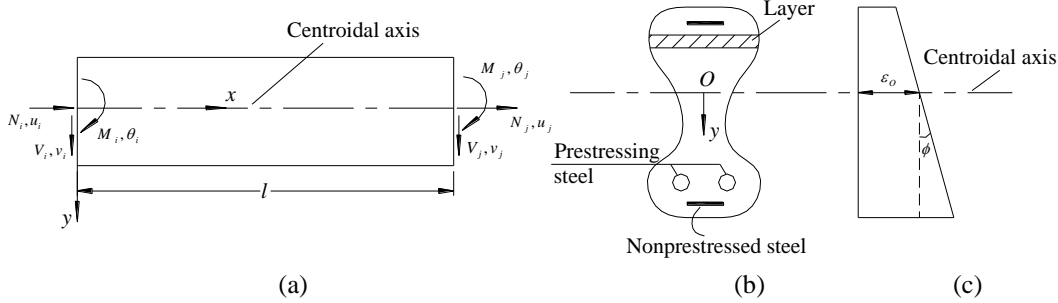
Element, section and strain: (a) beam element; (b) layered section; (c) section strain
